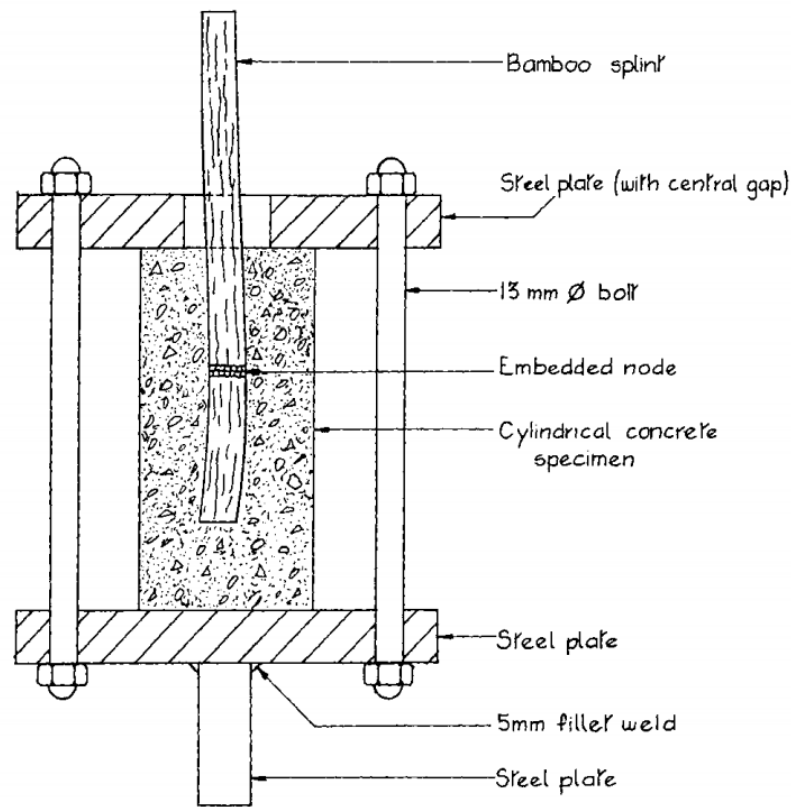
Concrete cylinder with bamboo reinforcement used in the pull-out test (Kankam and Perry 1989)
